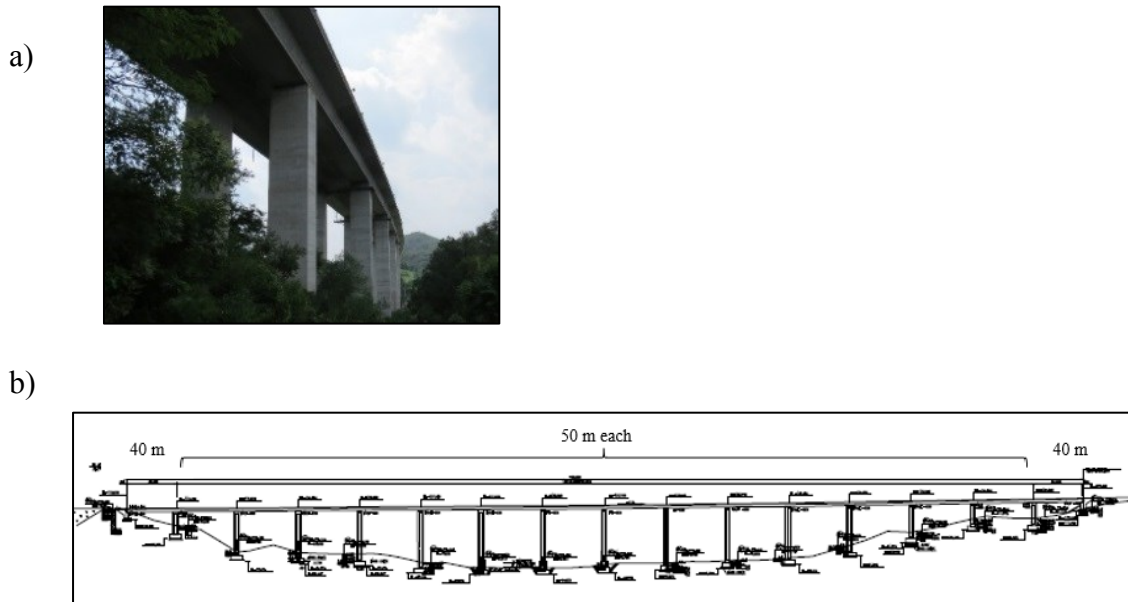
PSCB bridge details: (a) photograph of the bridge; (b) longitudinal elevation
